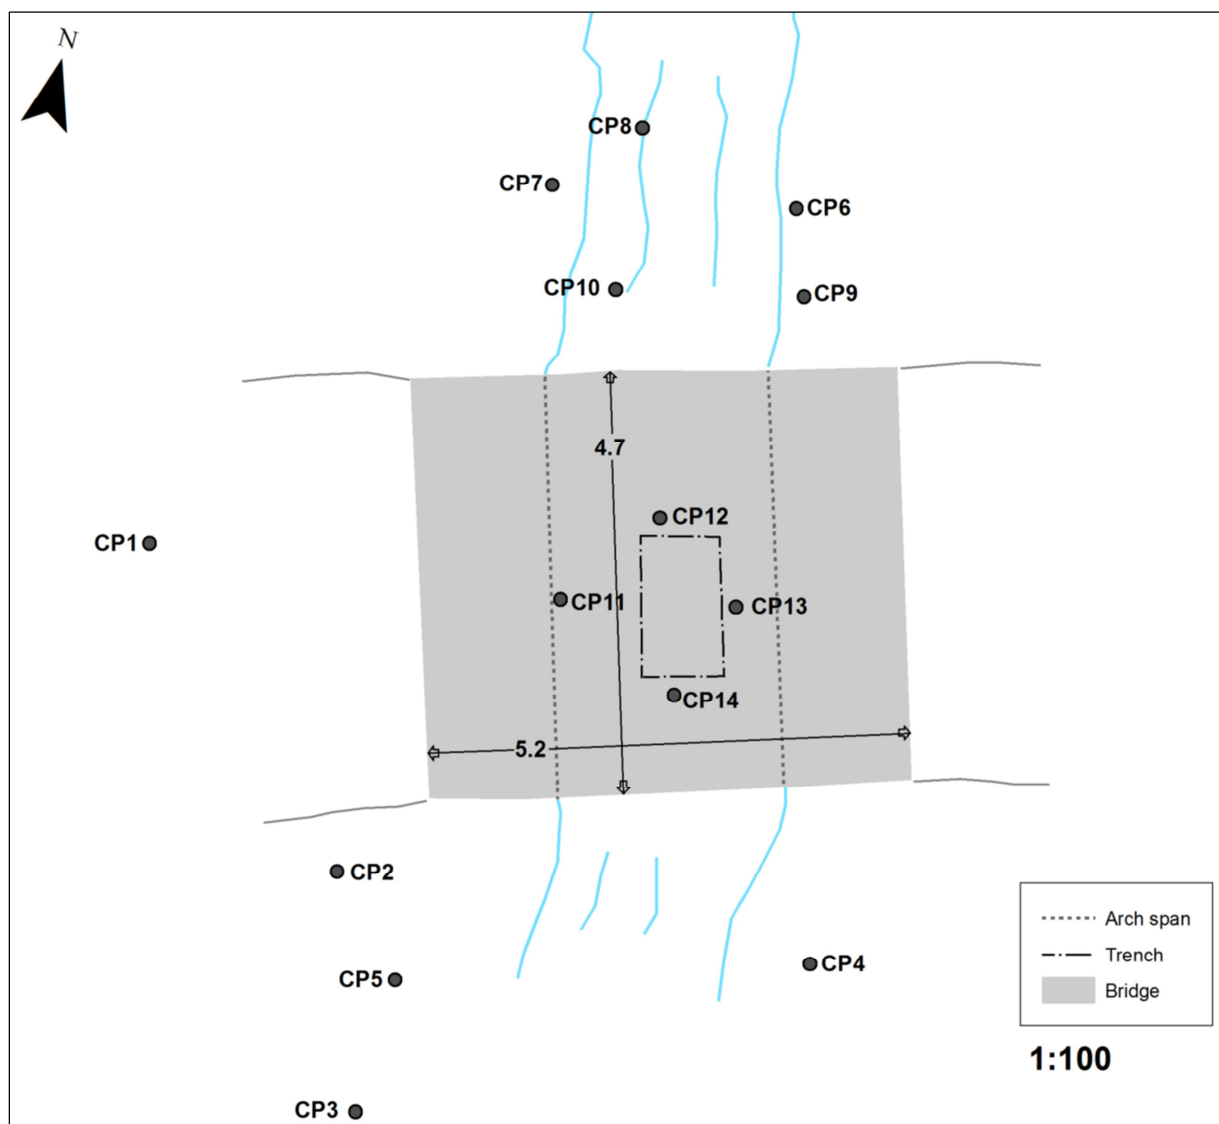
Sketch plan of Bridge 007 showing trench location and camera positions marked by “CP”
